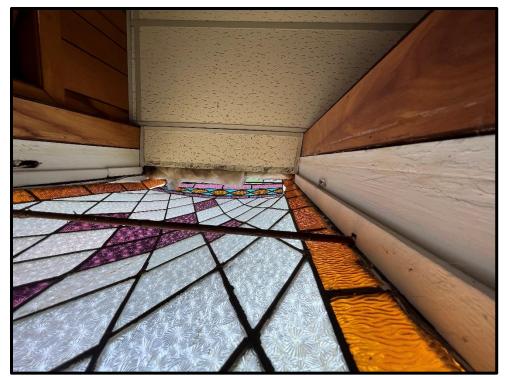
7119 Tecumseh Road Interior – Bowed and Warping Stained Glass Windows
